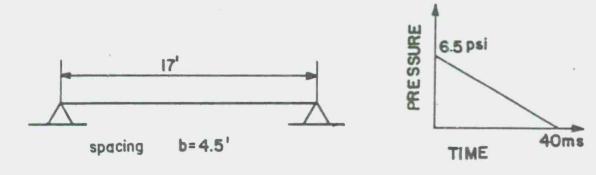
A-1 Beam configuration and loading, Example 5A-1.
